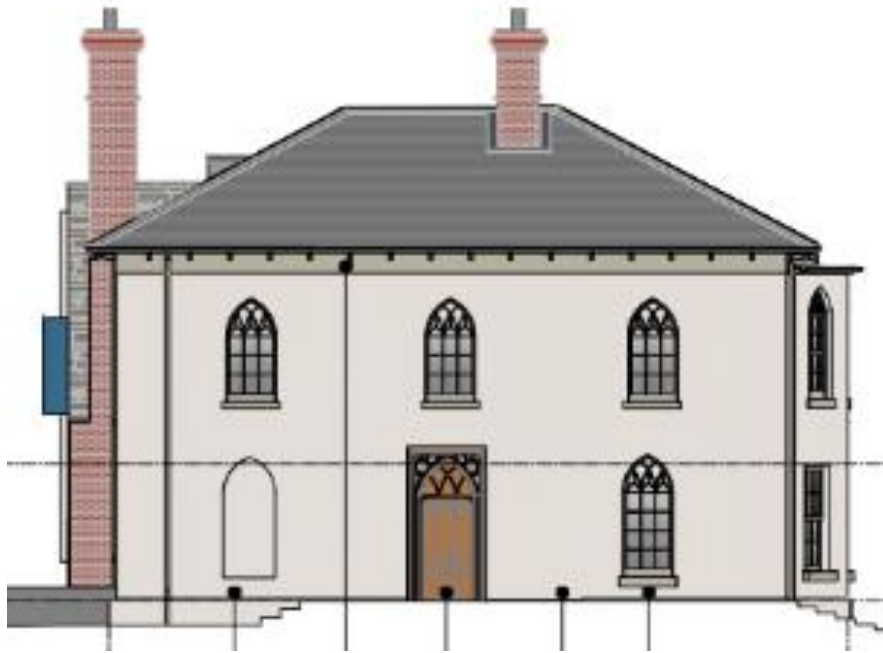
Proposed west elevation of Priory House © Gaunt Francis Architects
